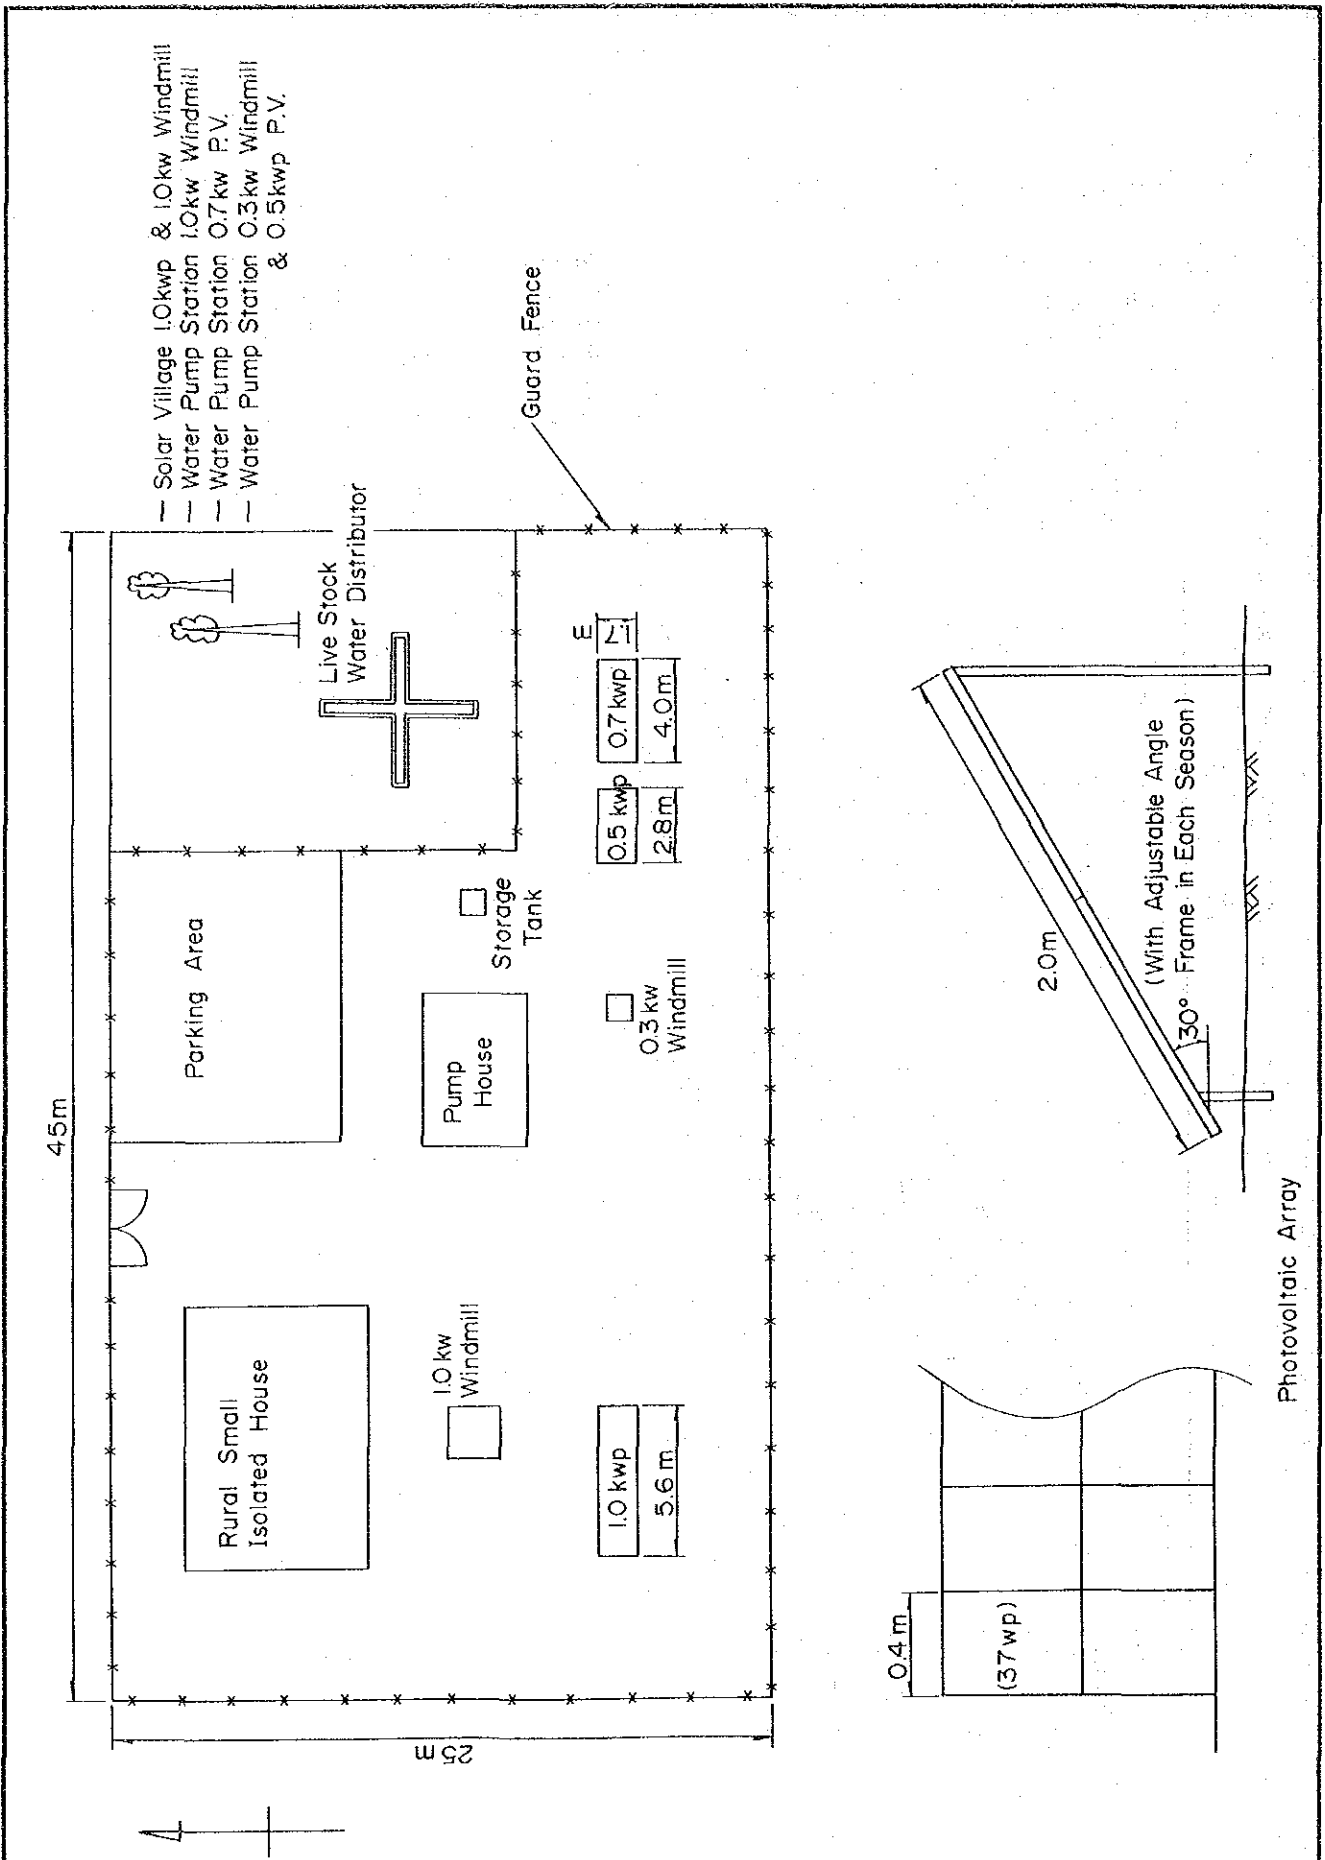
Preliminary Layout of Hasa Mini Pilot Plant
